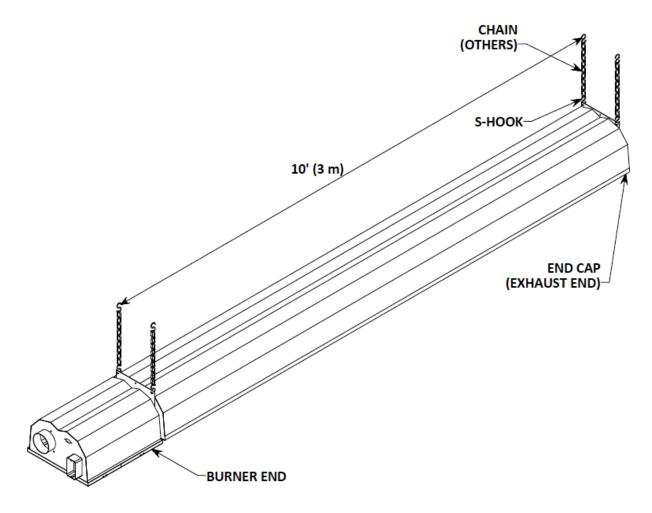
HORIZONTAL INSTALLATION - 10' (3m) PKG
